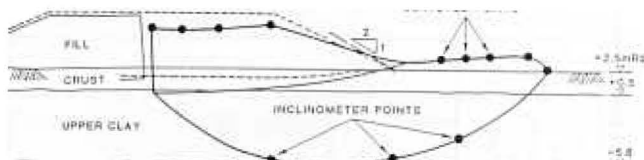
Failure Mode of Embankment and Foundation (Brand and Premchitt 1989)
